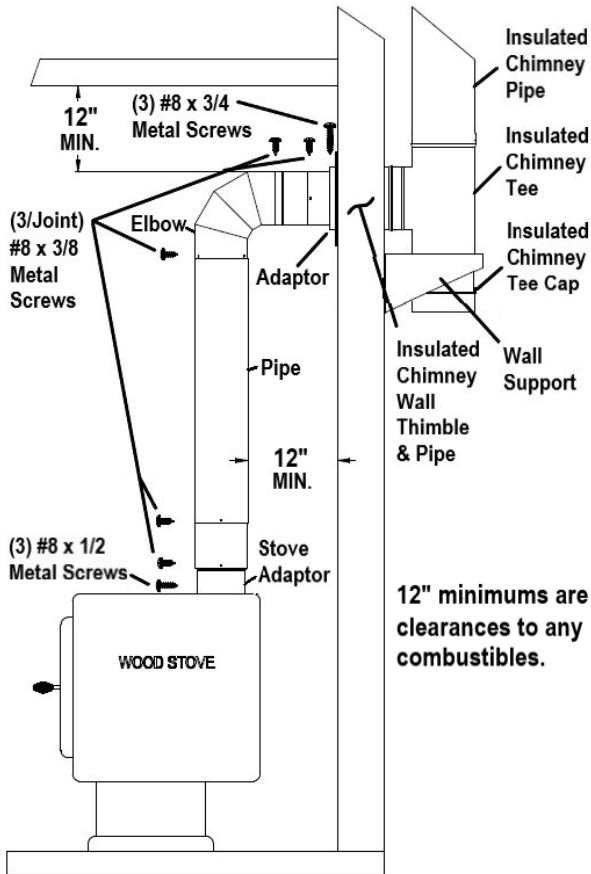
DW Chimney Connector to Side Wall Insulated Chimney Installation
